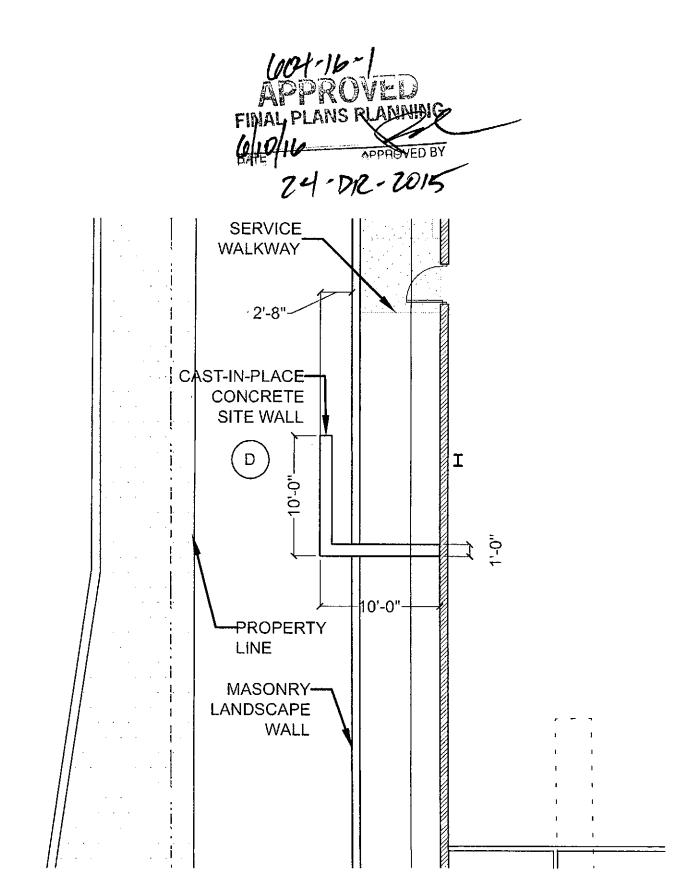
DETAIL PARTIAL SITE PLAN AT EAST WALKWAY
